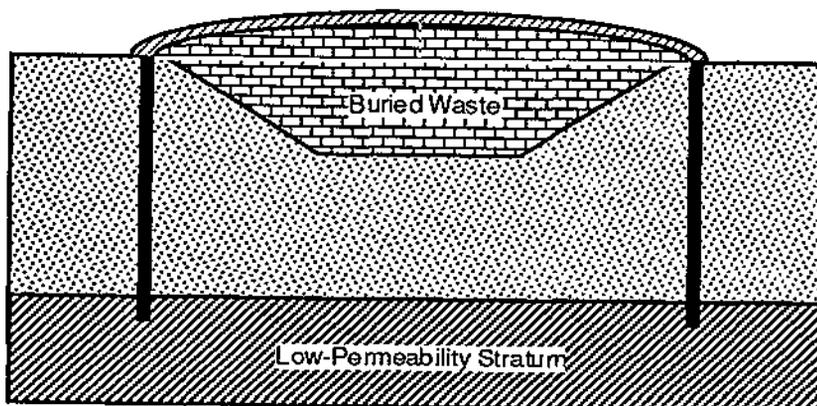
Example of Vertical Cutoff Wall to Limit Long-Term Contaminant Transport.
